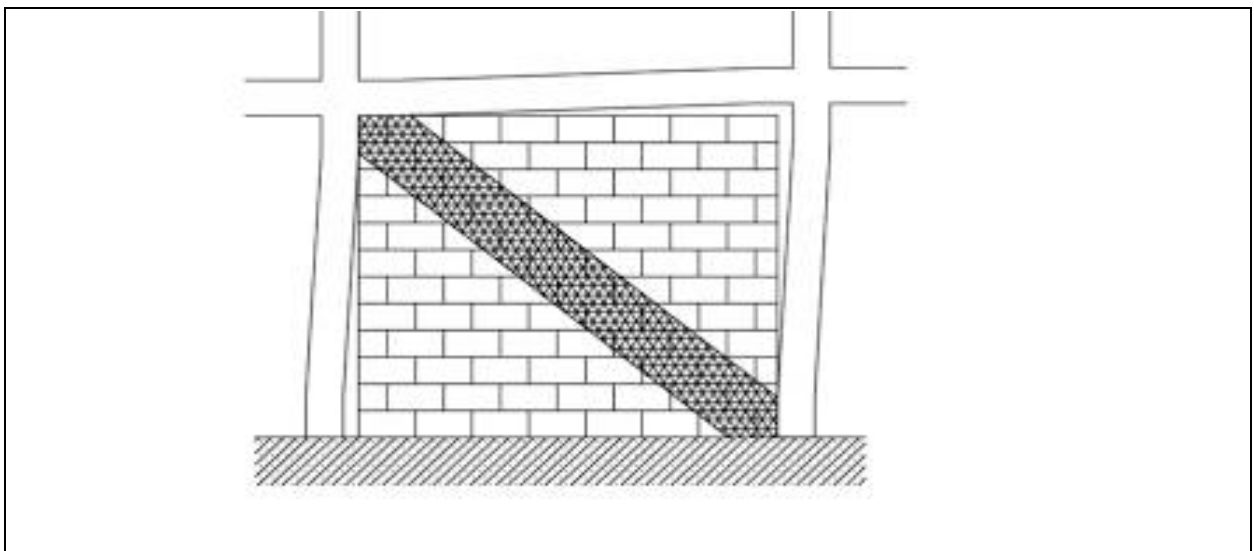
Frame Wall with Infilled Frame (<https://www.structuremag.org/?p=13122>)
